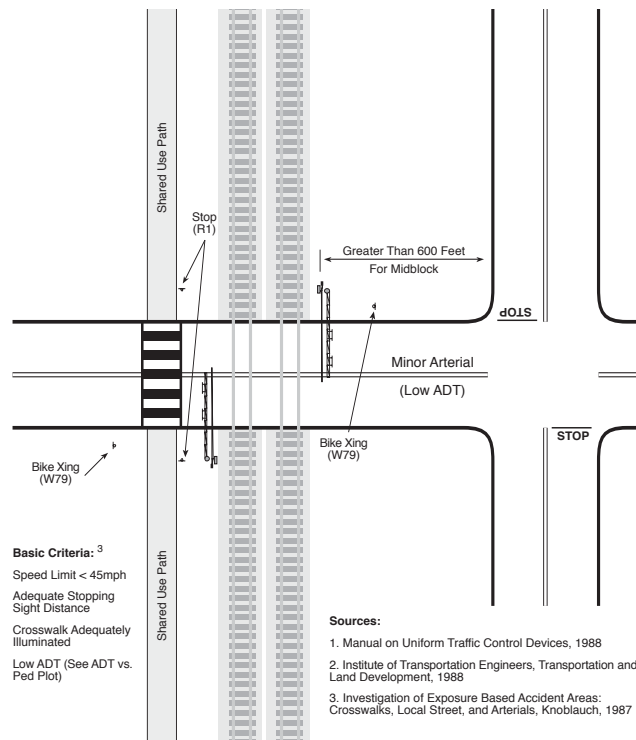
Roadway crossing type 3 (unprotected crossing)
